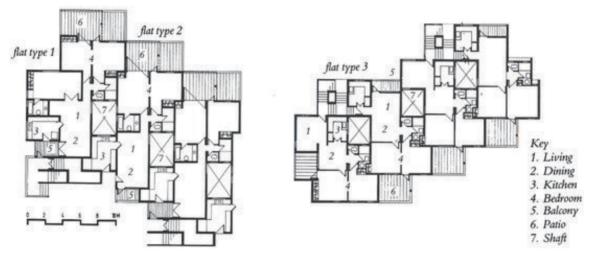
Typical floor plans showing the internal layouts of three types of units.
